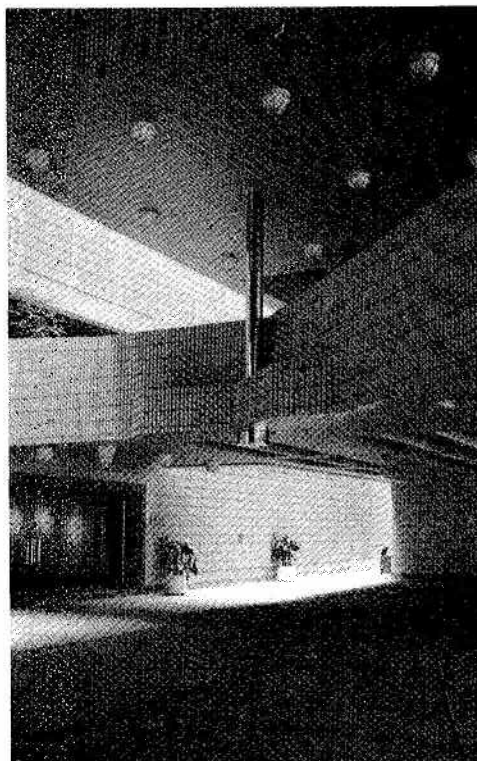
Solid billet hangers supporting access deck within studio theatre
